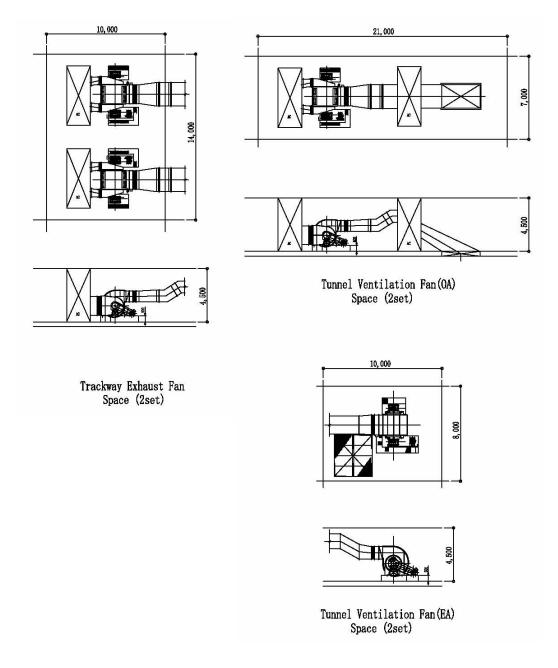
Diagram of Tunnel and Track Ventilation Facilities Flow
